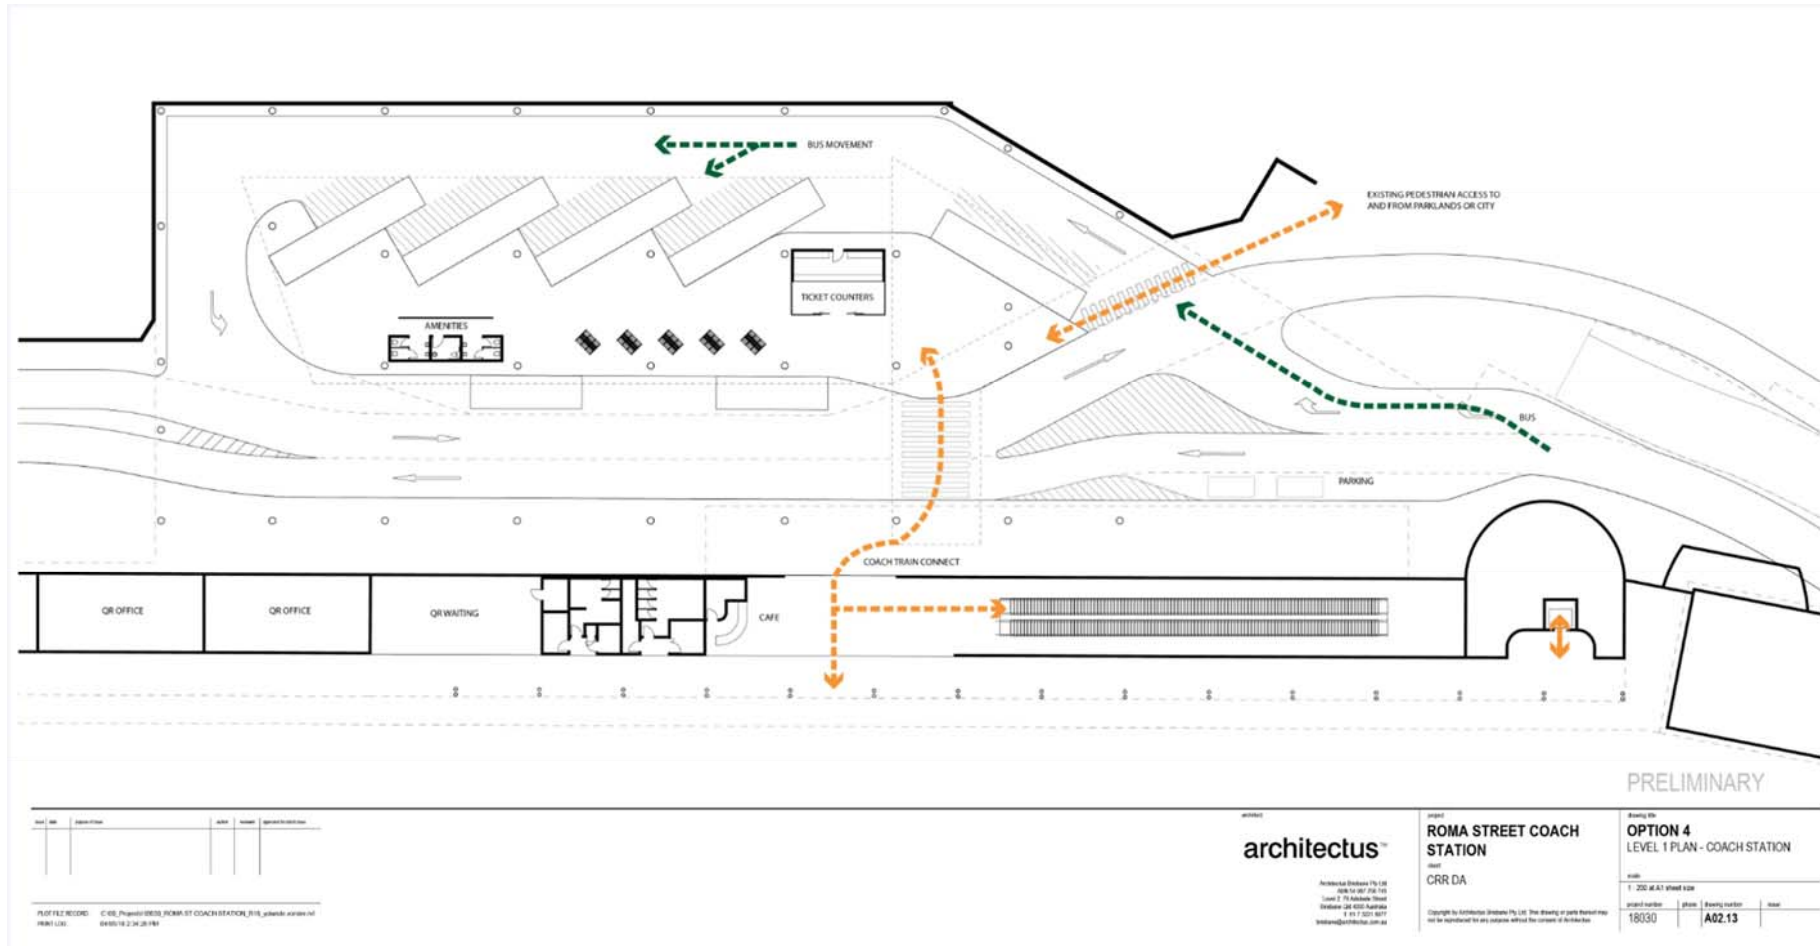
2018 proposed coach terminal layout at Parkland Crescent
